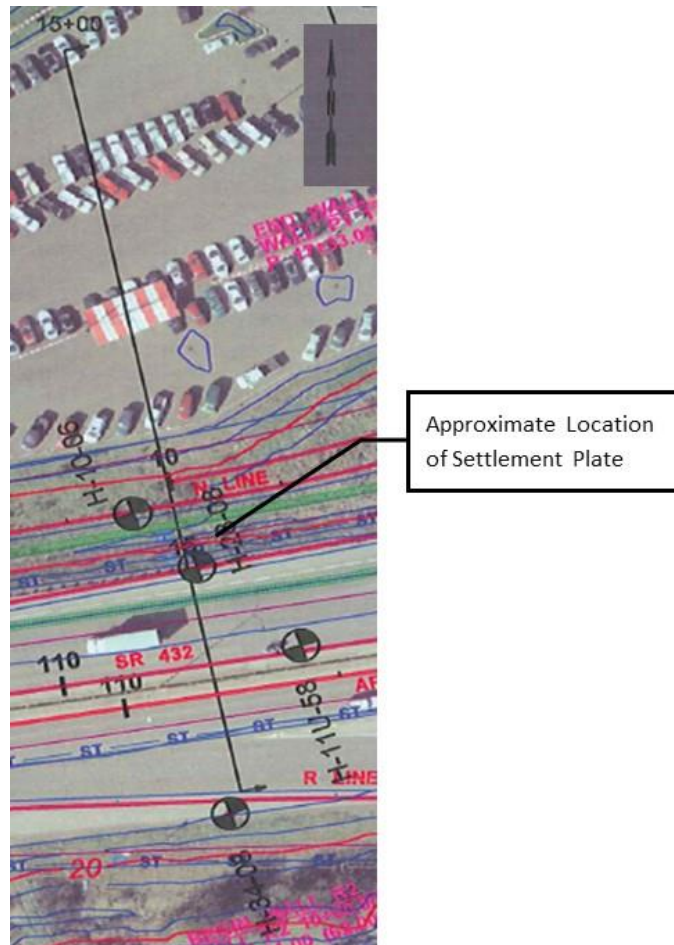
Plan View of Site No. 9, Section 15+00, on the P-Line with Boring Locations.
